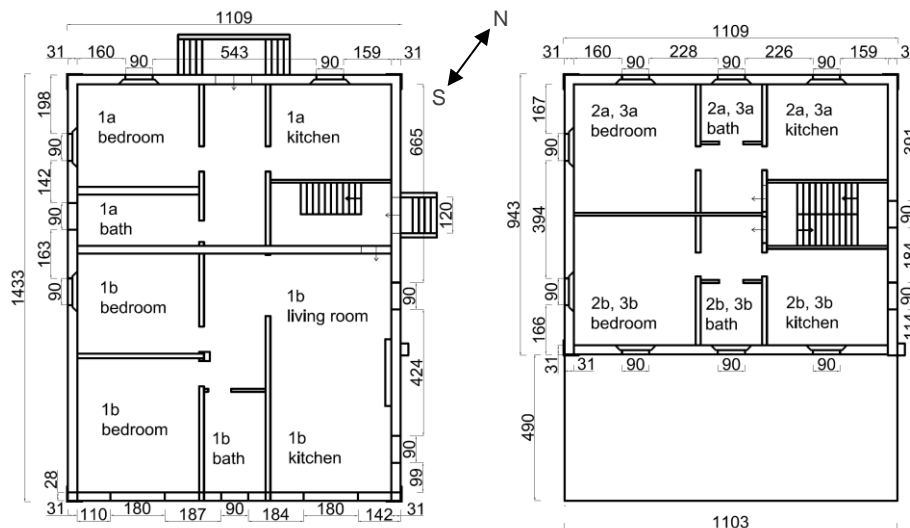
Plans of the apartments: first floor on the left; second and third floor on the right
